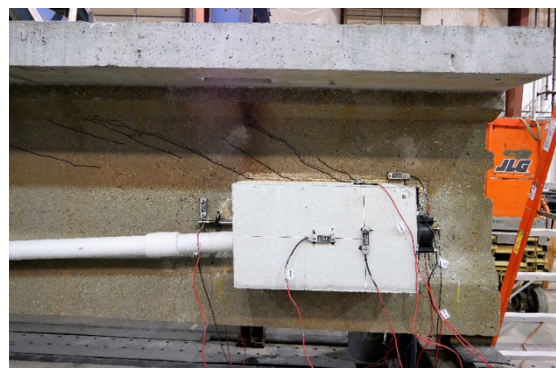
Reinforced concrete block anchorage (Leicht et al., 2022)
